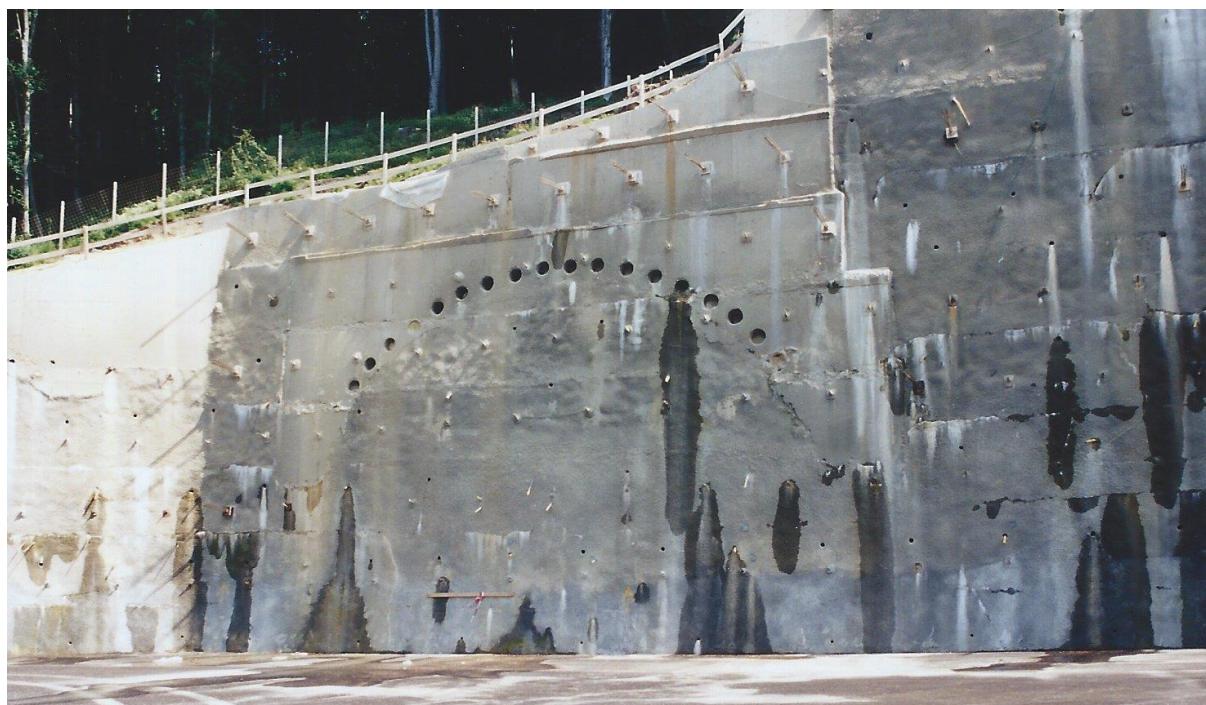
Shotcrete support with pre-stressed anchors in upper strata and unstressed nails in denser soils (source Electrowatt Engineering Services)
